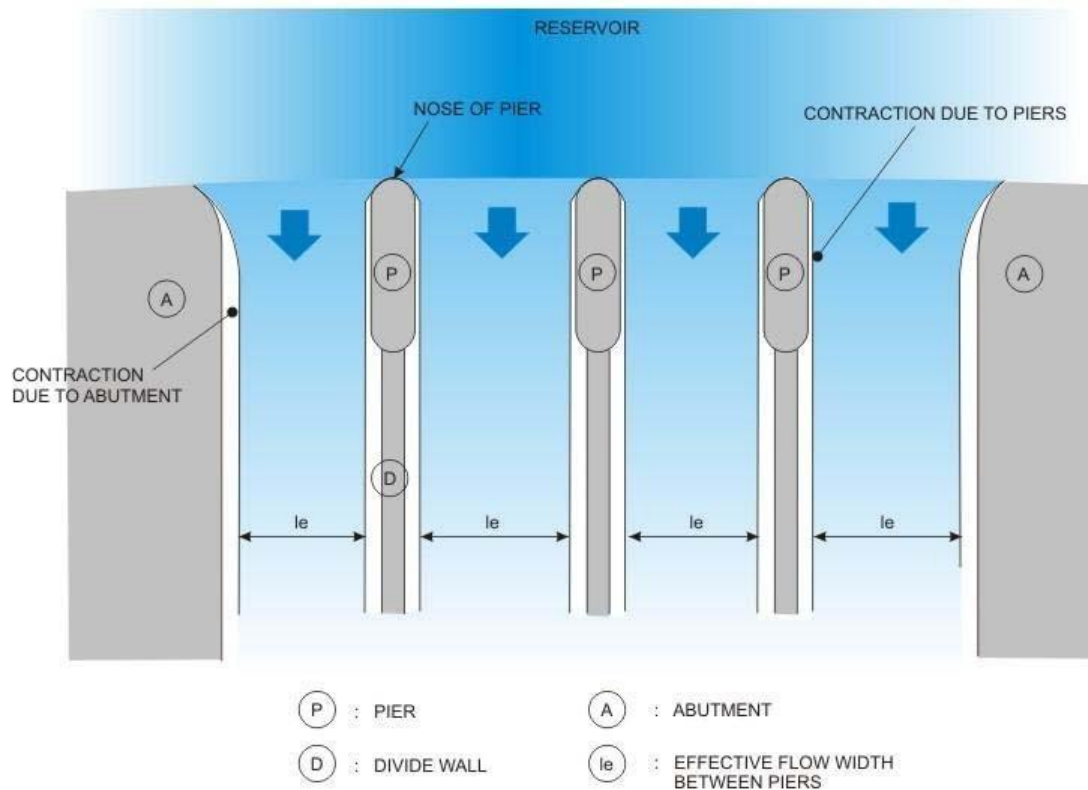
Abutment and pier contractions shown on a spillway plan
